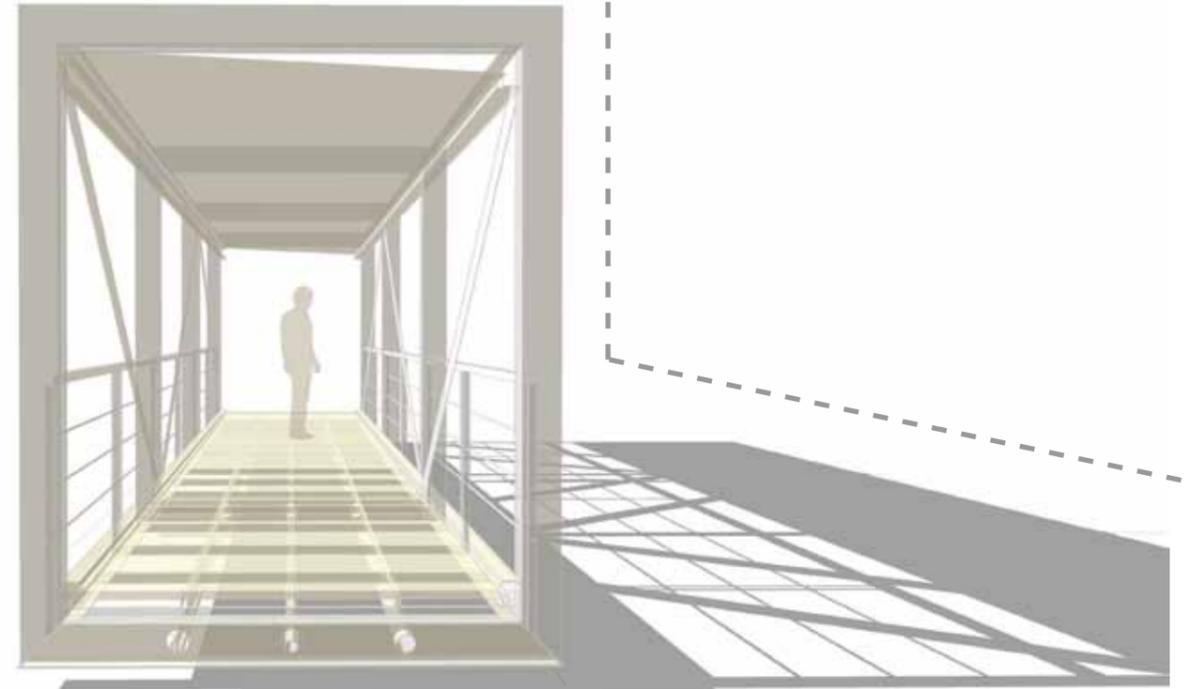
\_26.] Layered 3D section showing bridge structure, 1800mm wide bridge with span lengths varied in each scenario. Floor to ceiling height 3000mm.
